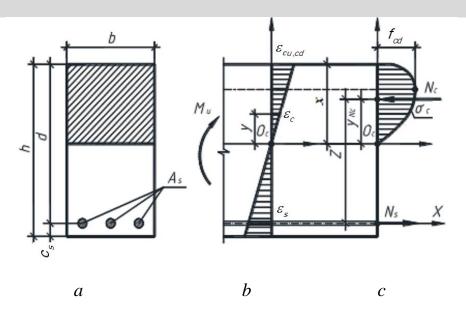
Design model of the normal section: a - normal section of the element; b - strain diagram; c - stress model
